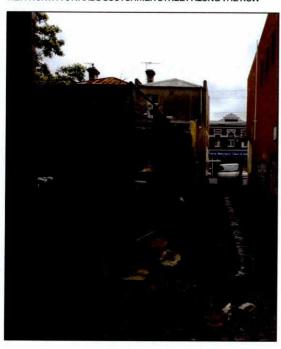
VIEW OF ADJOINING DWELLINGS AT 36 EGREMONT STREET
